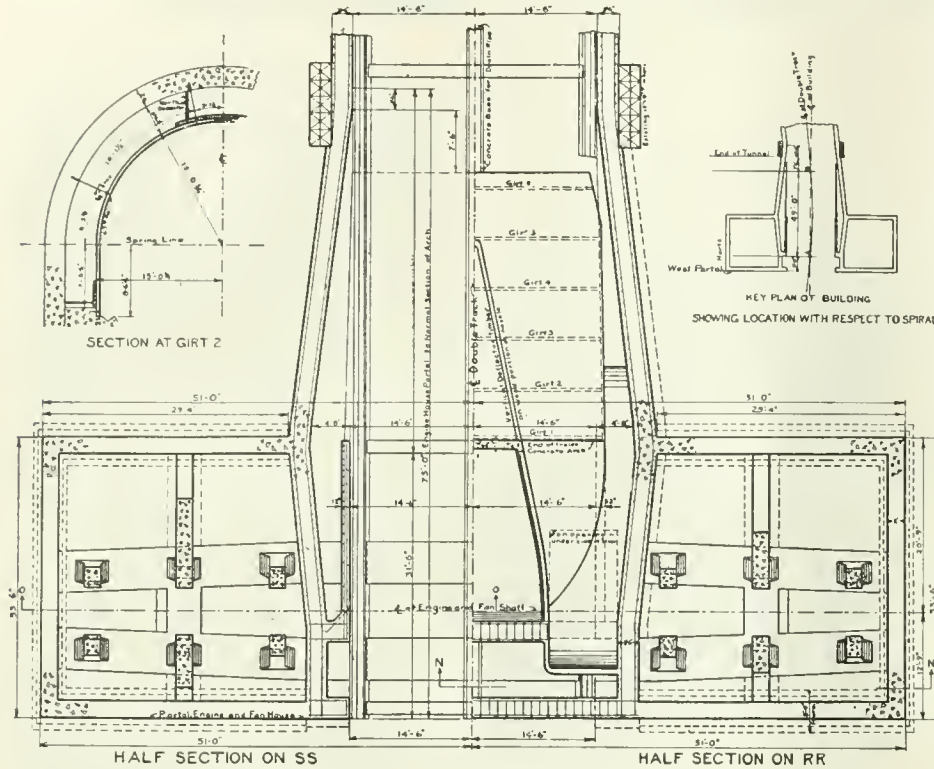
Connaught Tunnel Ventilation, Sectional Plan.
